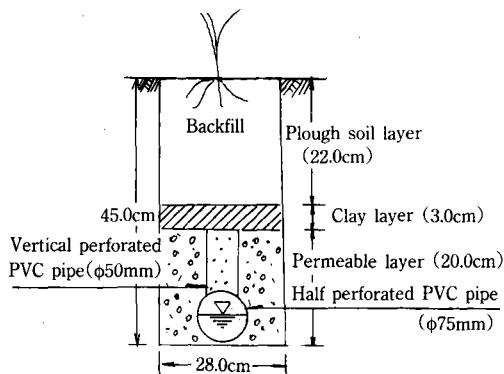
Cross-sectional view of installation of perforated PVC pipe
